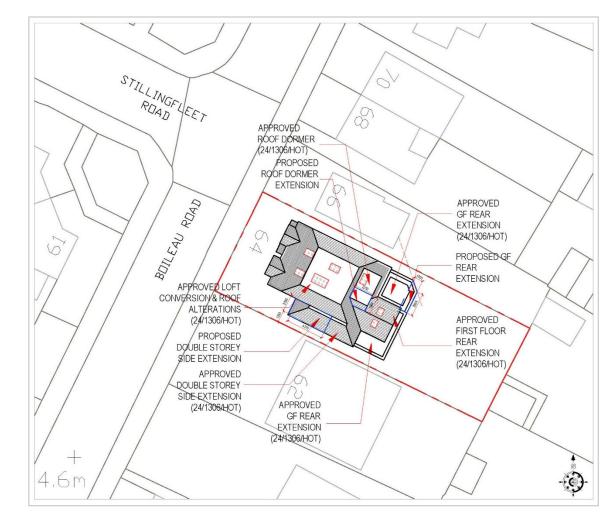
Proposed Block Plan of 64 Boileau Road where the erection of a part one, part two-storey side and rear extension and a rear dormer loft conversion is proposed
